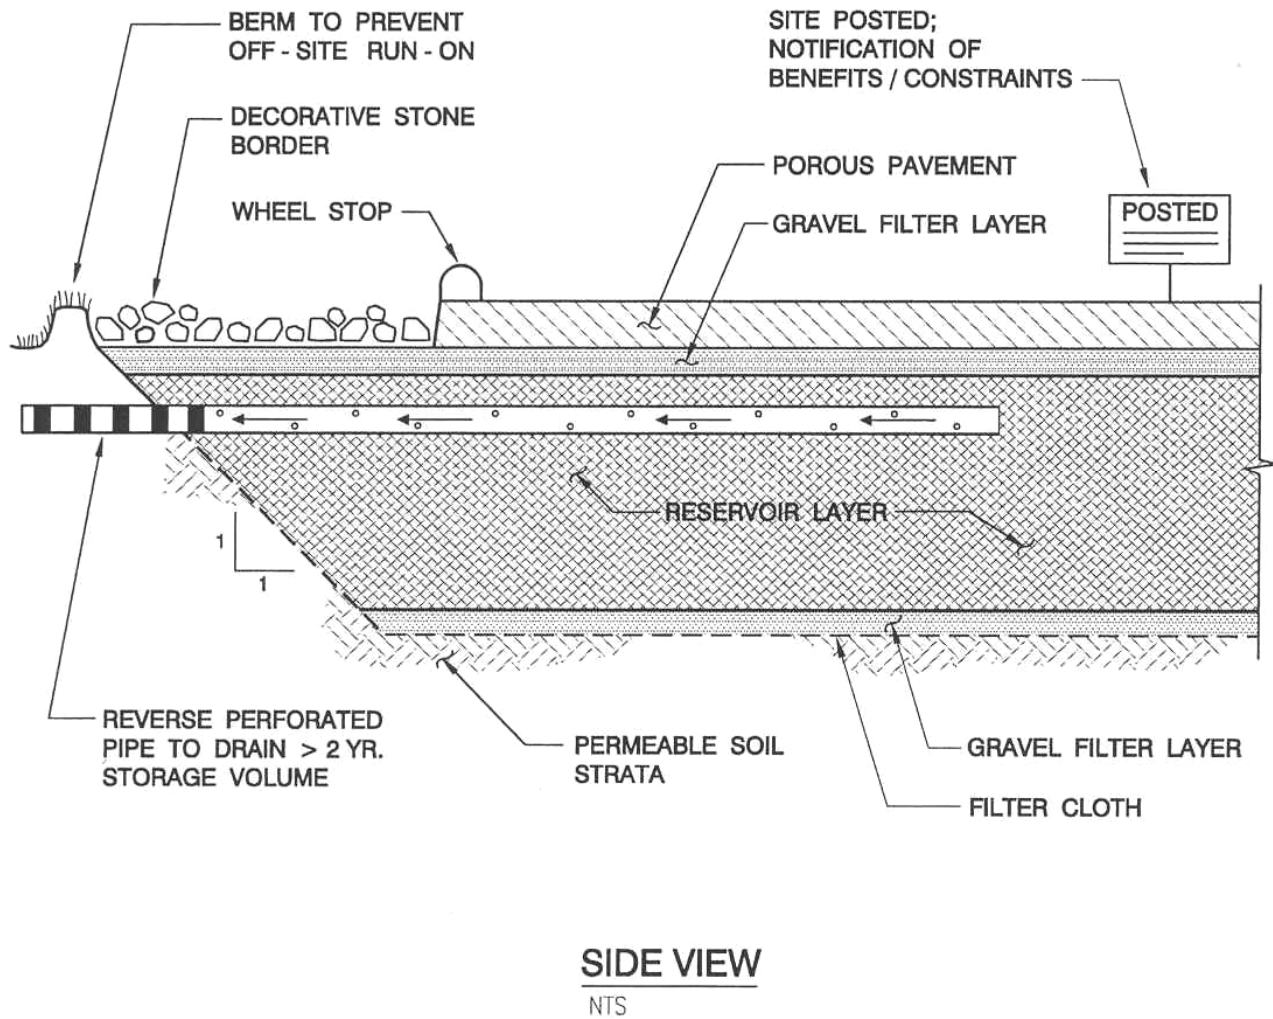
SCHEMATIC OF POROUS PAVEMENT SYSTEM (FROM GVRD, 1999)
